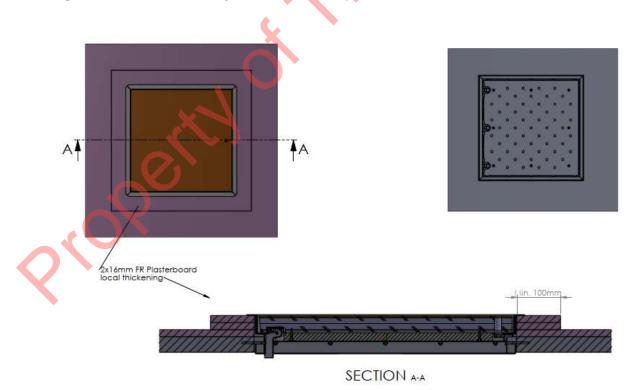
FyreSHIELD access panel in AlphaPanel + plasterboard wall system (minimum overall thickness 83 mm) – Configuration 1
